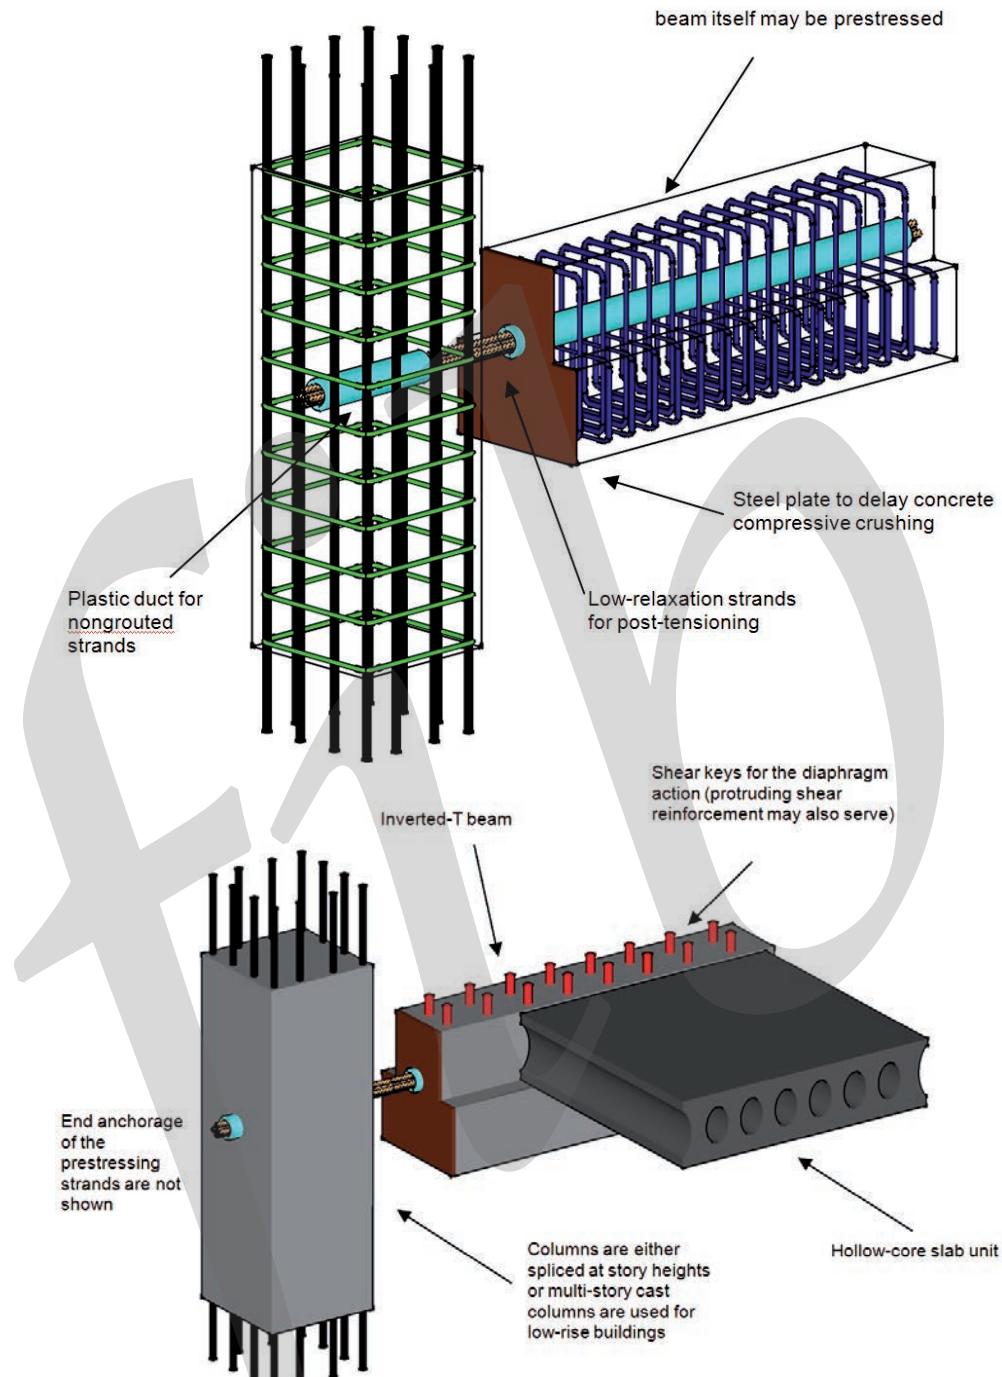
Post-tensioned moment-resisting connection, (indicative) reinforcement and slab units
